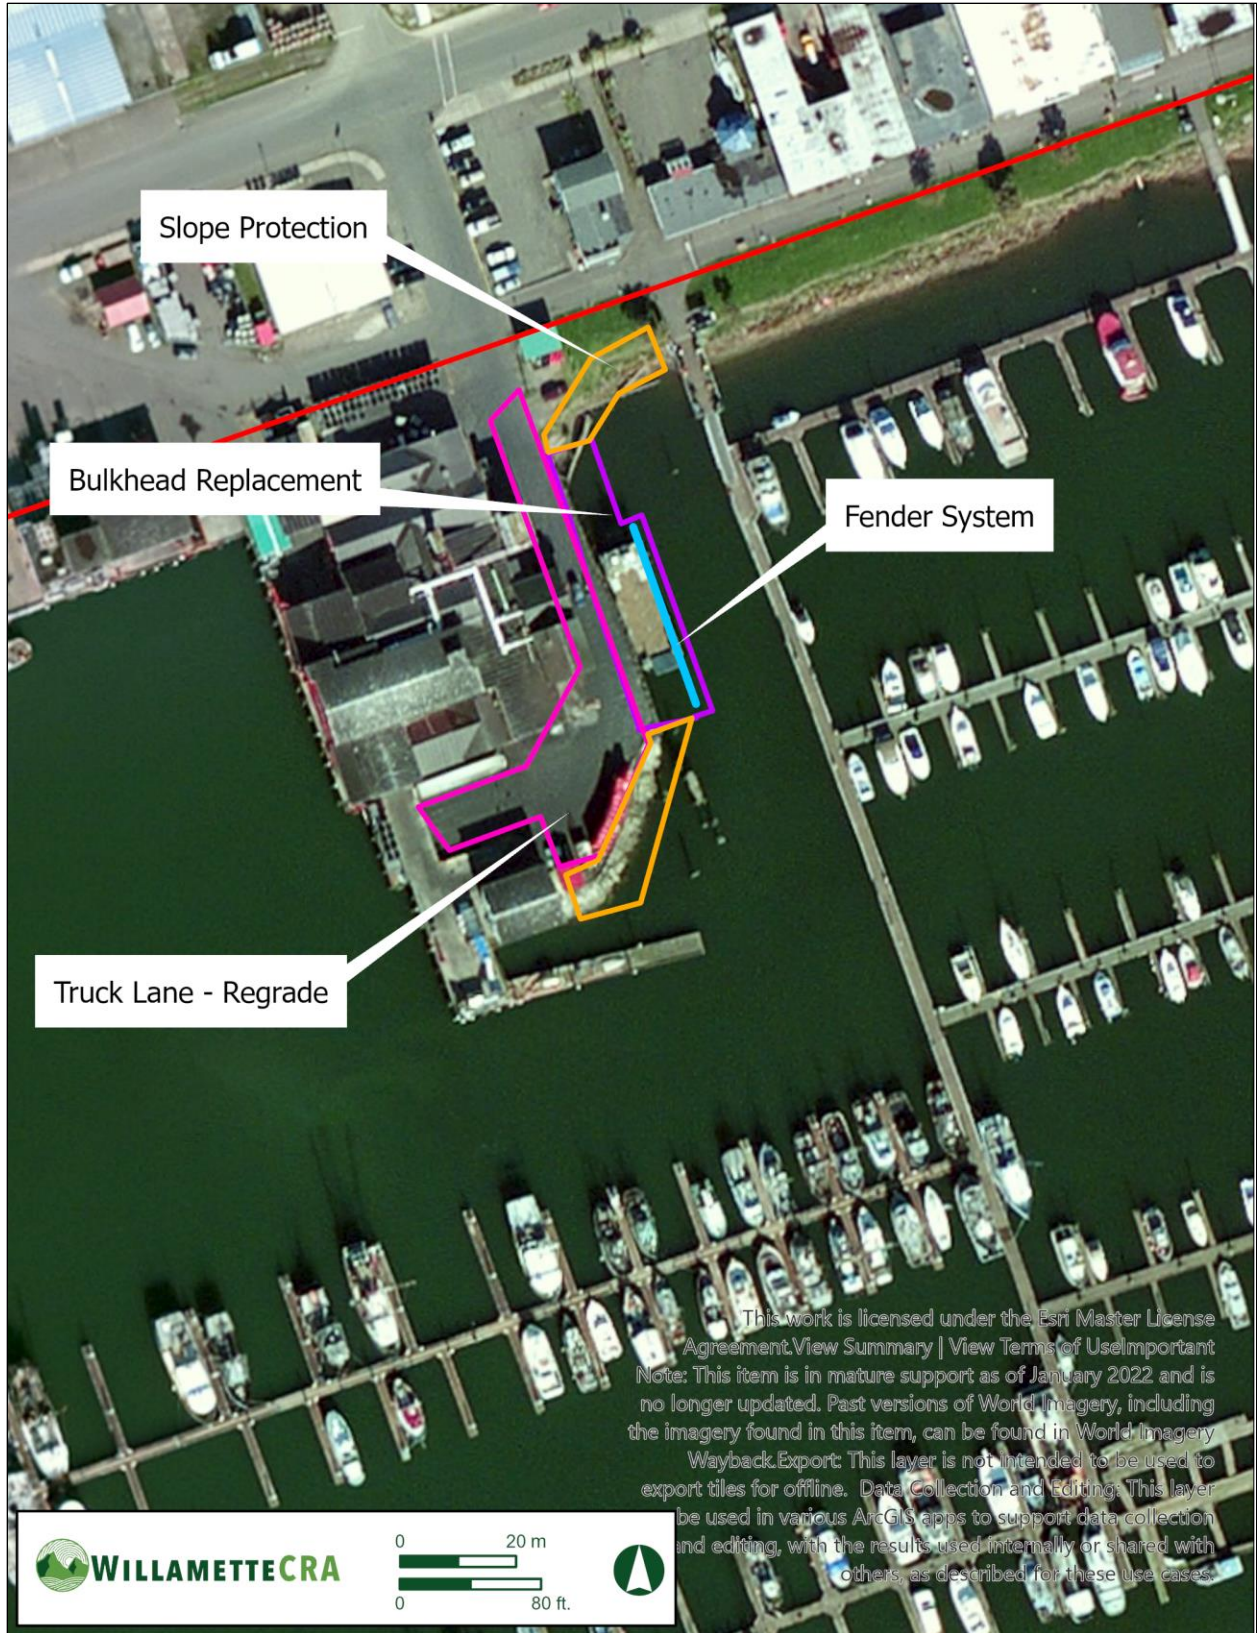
Overview showing proposed East Bulkhead and marine structure replacement elements.
